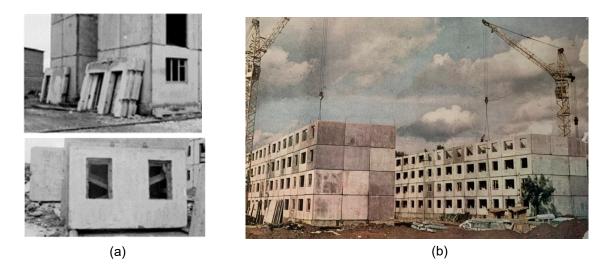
Construction of LPBs in Albania: (a) panels at the construction site (source: Abazaj, 2019) and (b) buildings under construction (source: Ministria e Ndërtimit, 1981). 48
